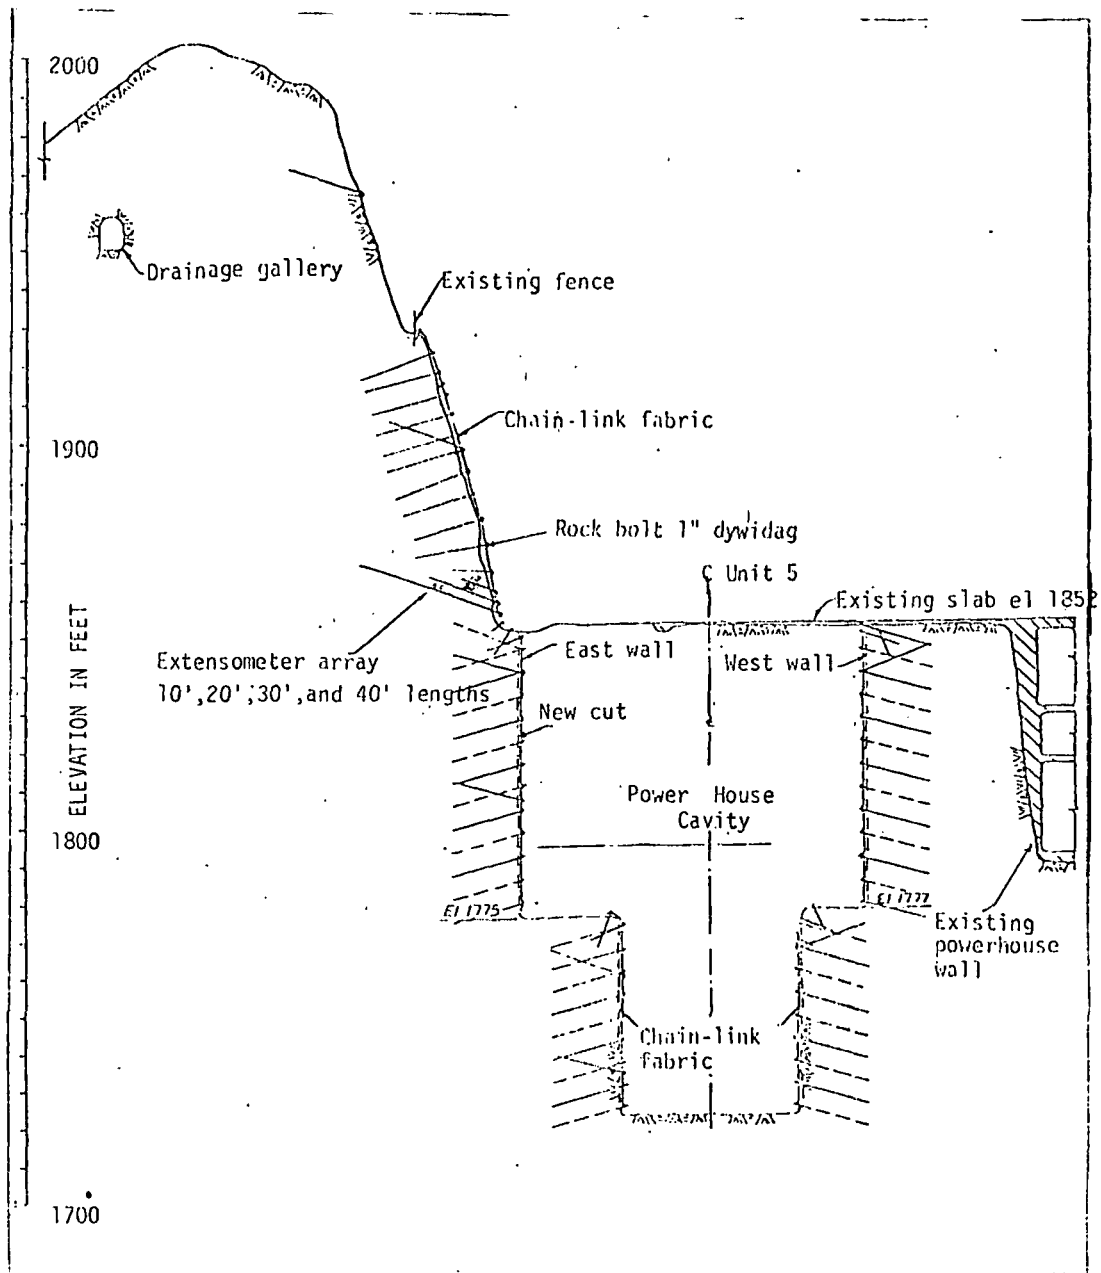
Rock Slope and Powerhouse - Rock Bolting
